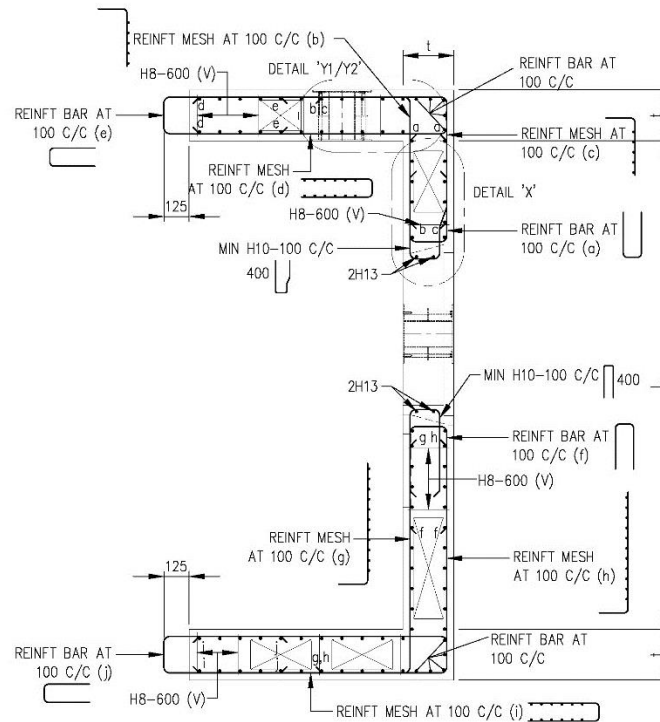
REINFORCEMENT BAR DETAILS OF WALL AND RIB FOR C-SHAPED PRECAST HS
